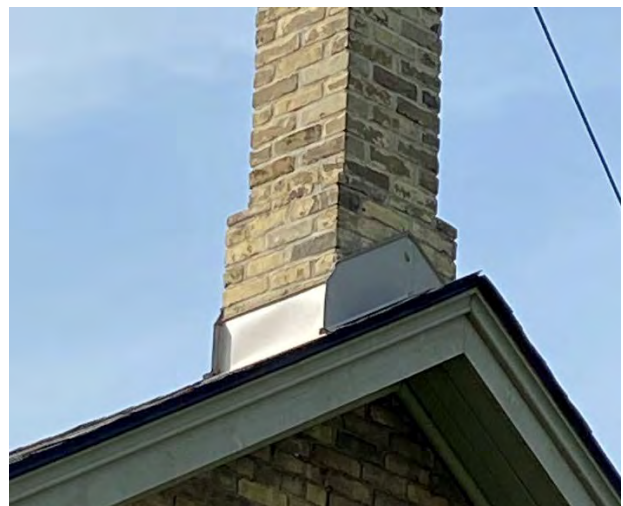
Chimney Flashing (Photo No. 13.1)
